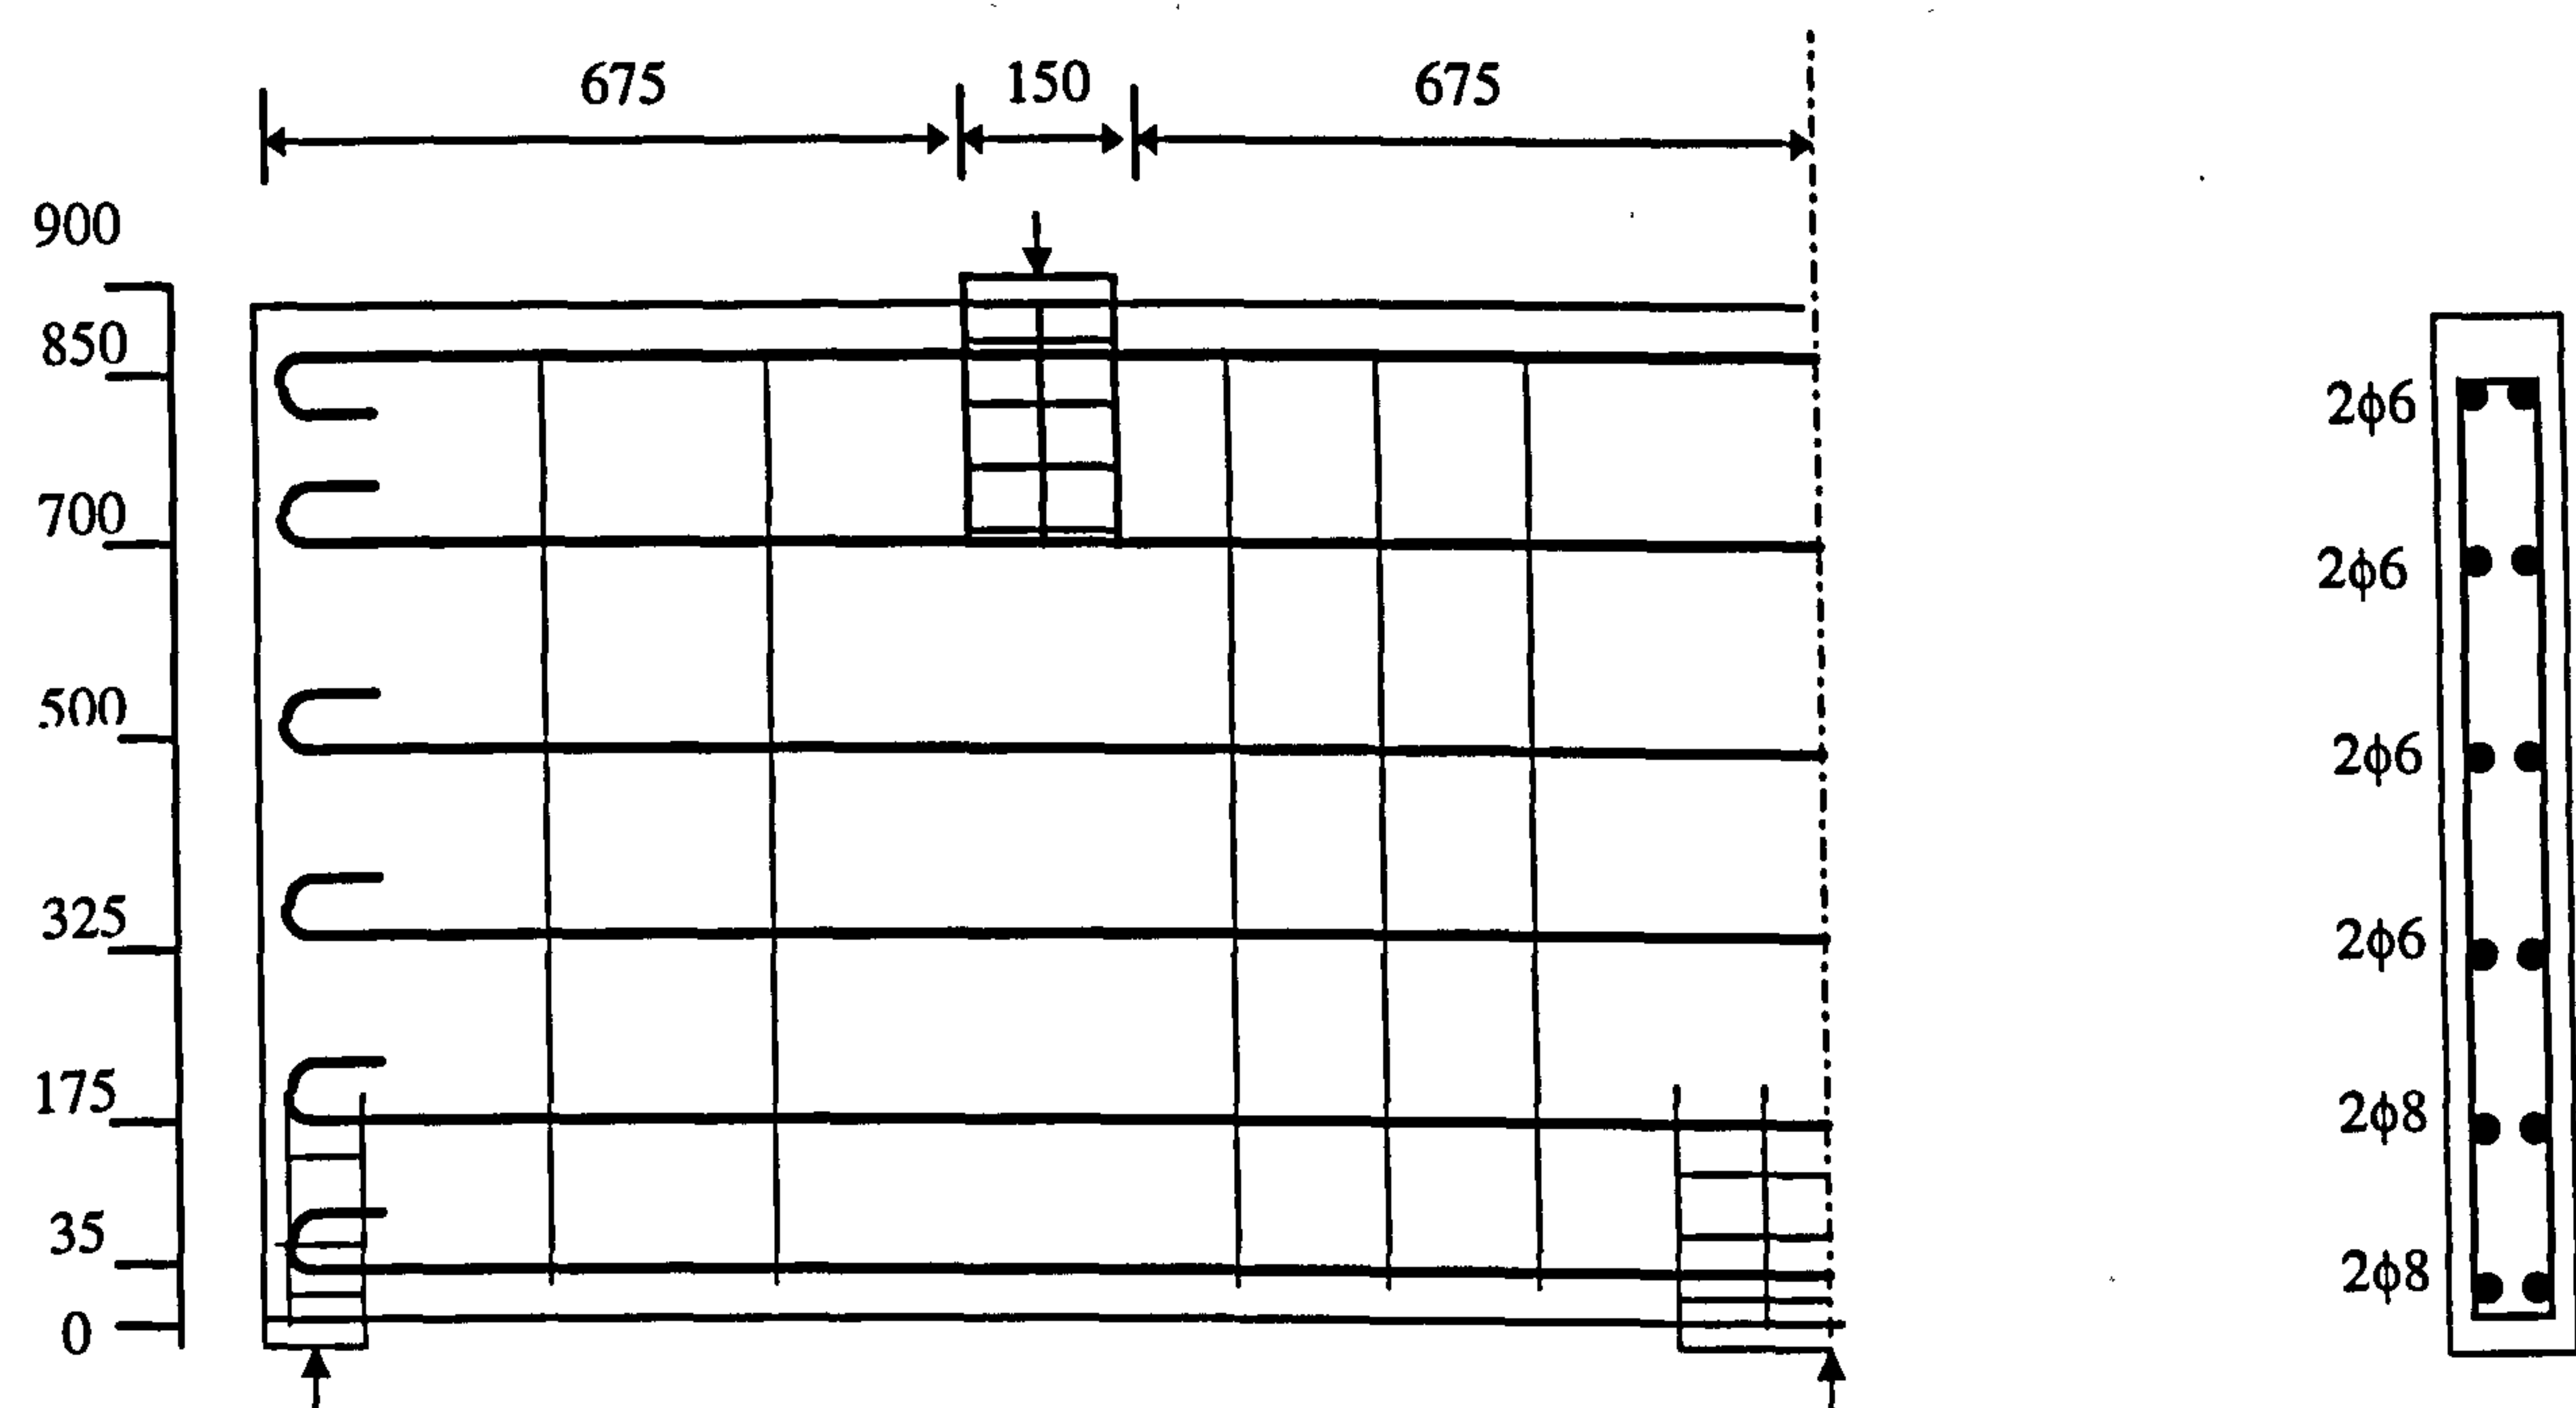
(d) Dimensions and reinforcement details for TGRAS4
